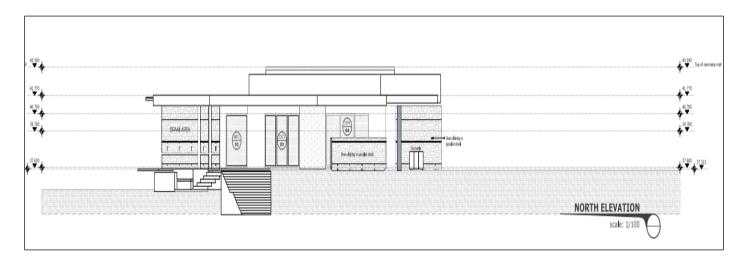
North elevation of the proposed entertainment facility (TMBA, 2018)
